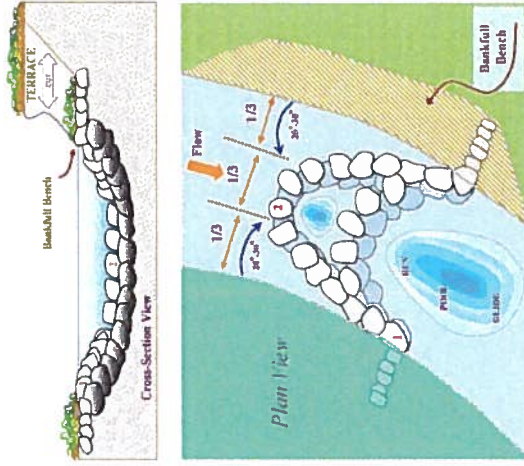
Boulder Cross Vane and Constructed Bankfull Bench (NEH 654)
